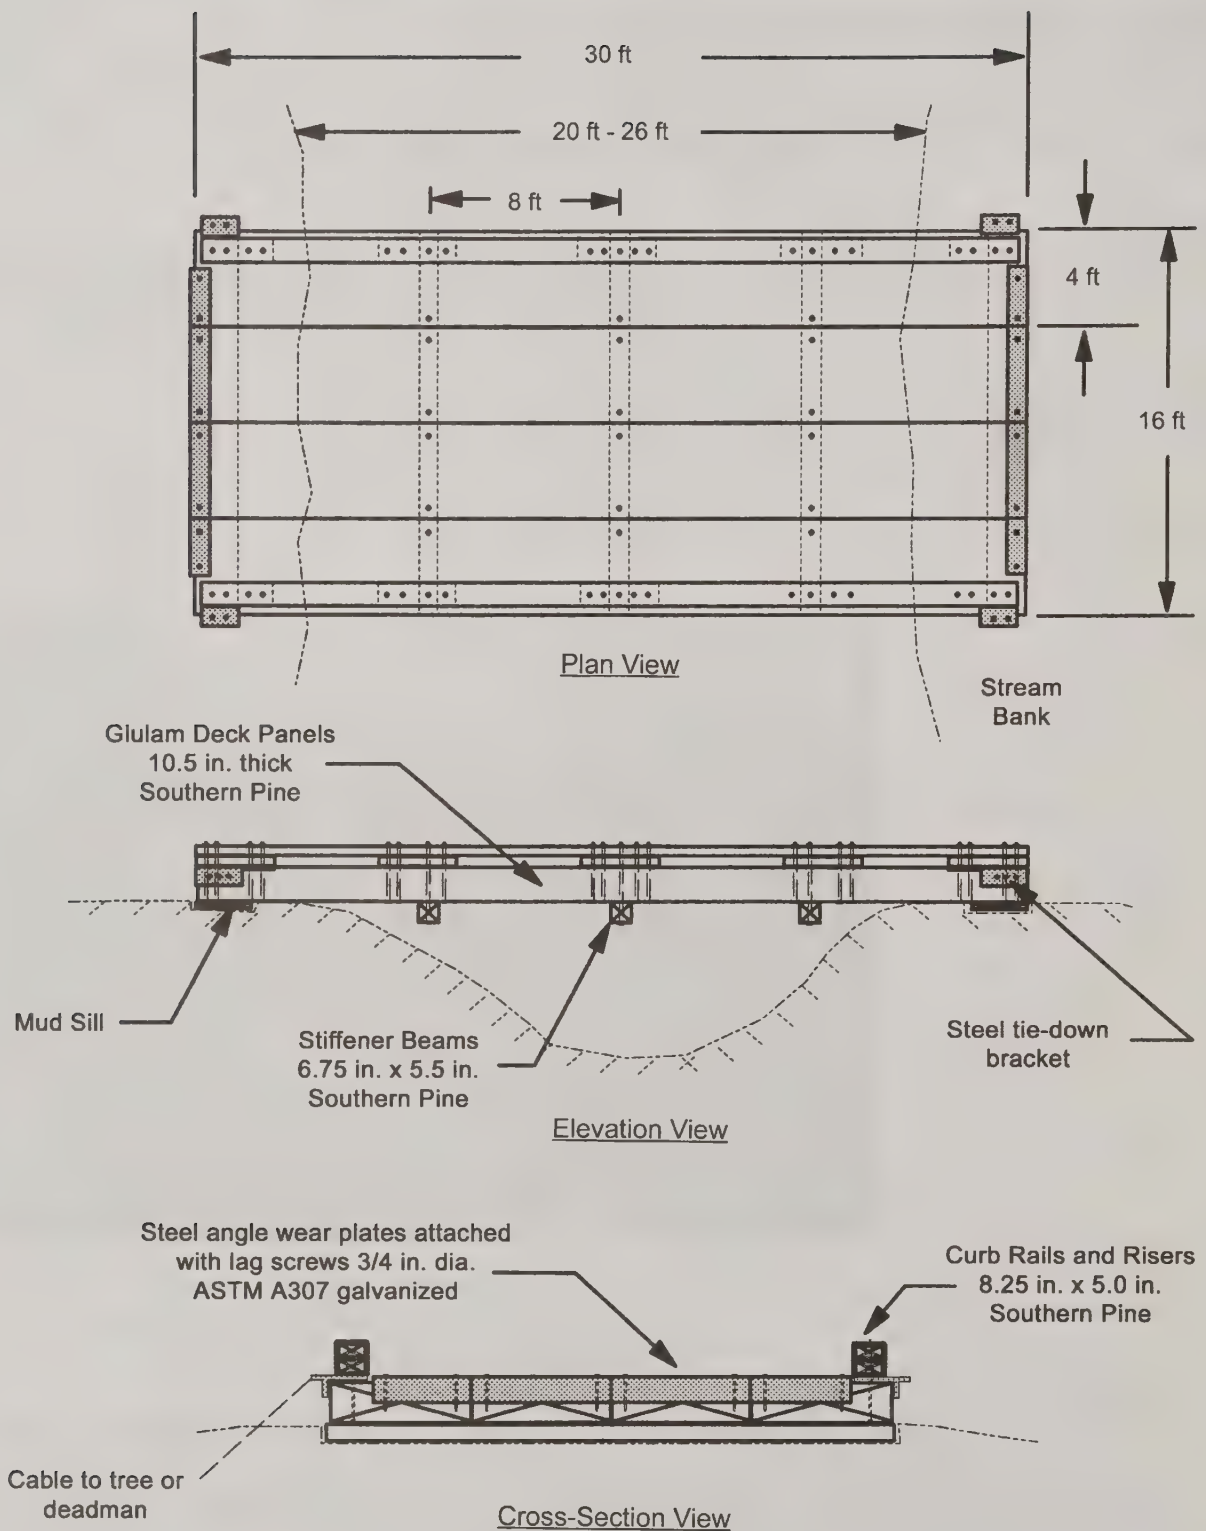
Plan, elevation, and cross-section view of Auburn's longitudinal glulam deck bridge for truck traffic. (Drawings provided by Steven Taylor)
